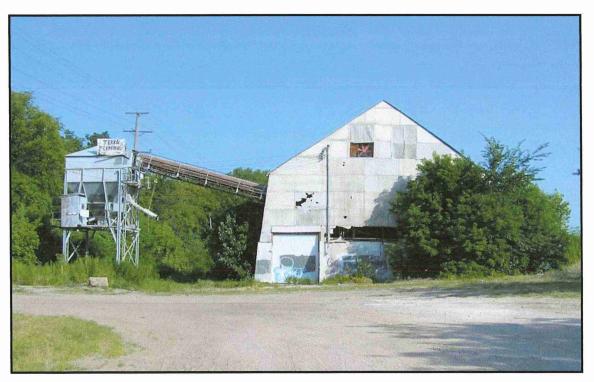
TERRA TERMINAL BUILDING IN 2004, LOADING FACILITY ASSOCIATED WITH CONCRETE SLABS AT LEFT, VIEW TO NORTHWEST
